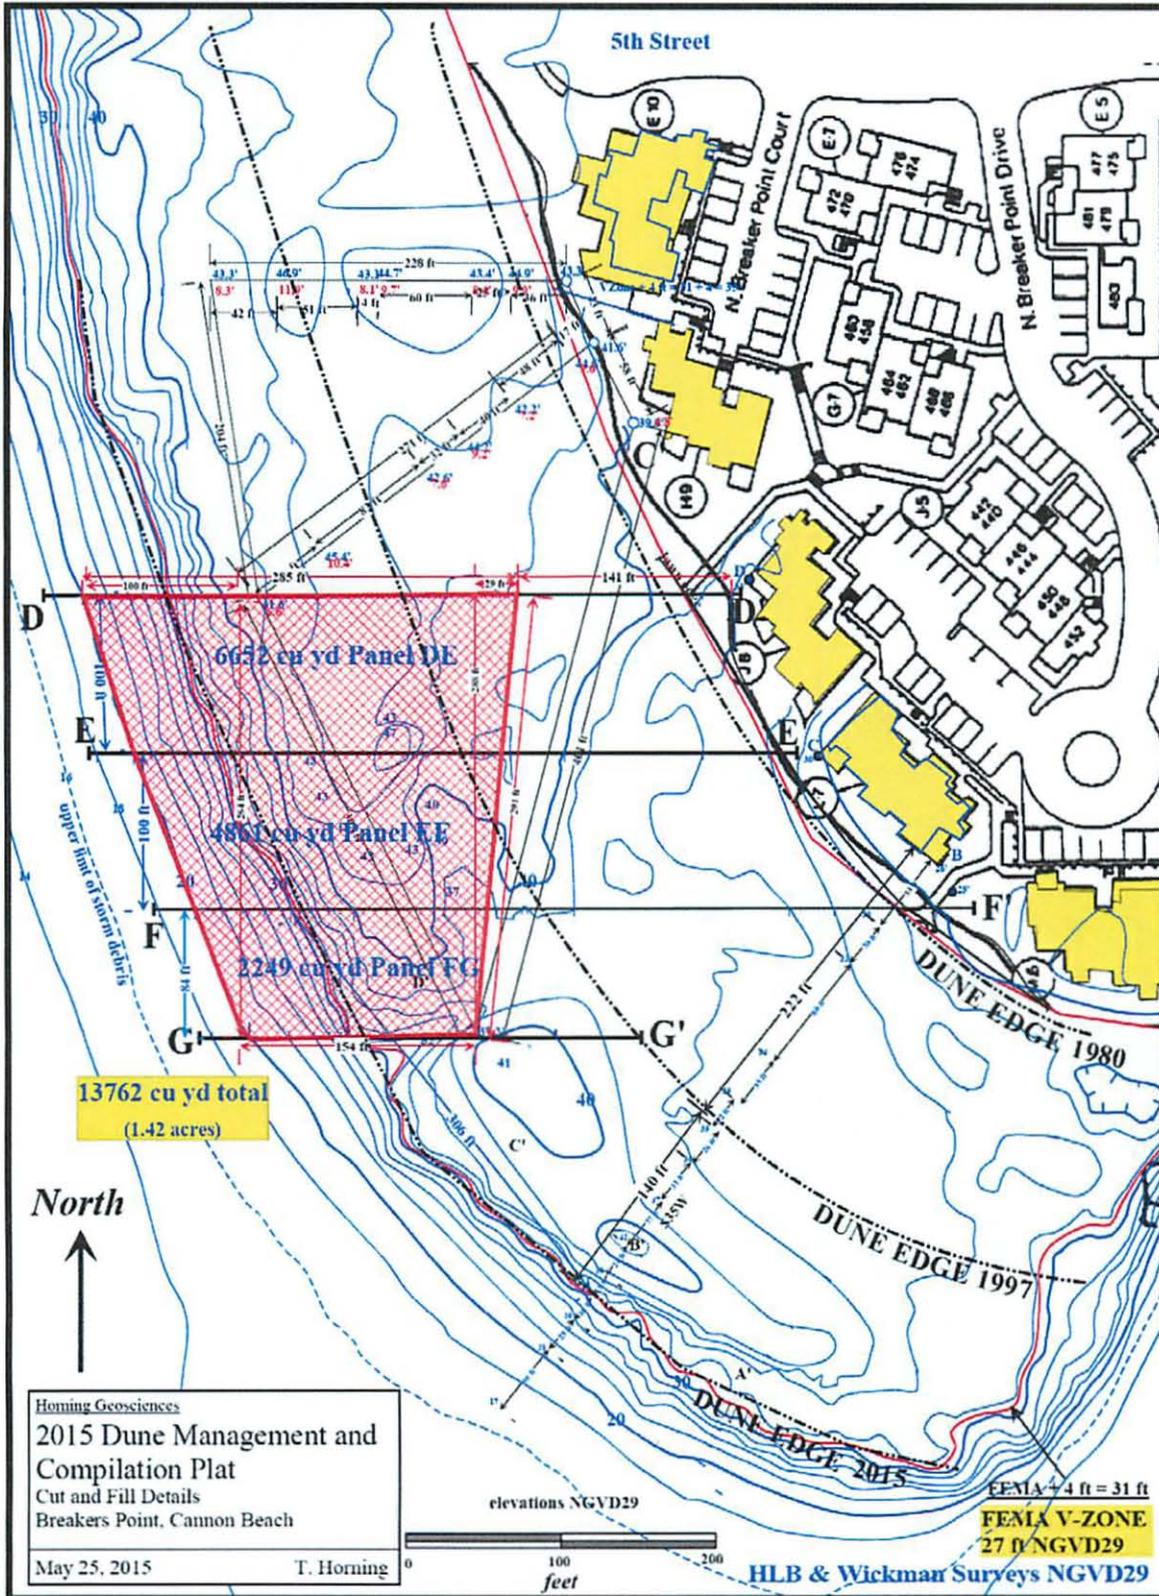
Summary plan for grading of dune sand at Breakers Point. Sand volumes (red hatch) are calculated by multiplying the distance between cross sections by the average cross sectional area of sand to be removed and summing for all three panels. Cross sectional areas are determined in Figure 5. Dune edges correspond to the 31 ft NGVD (FEMA + 4 ft) elevation contours for the relevant date, taken from past surveys and reports. Topographic survey profiles are by Castle Rock Surveying and Horning Geosciences. Additional data points and elevation contours from the City GIS LIDAR maps have been integrated to complete the elevation contours.
